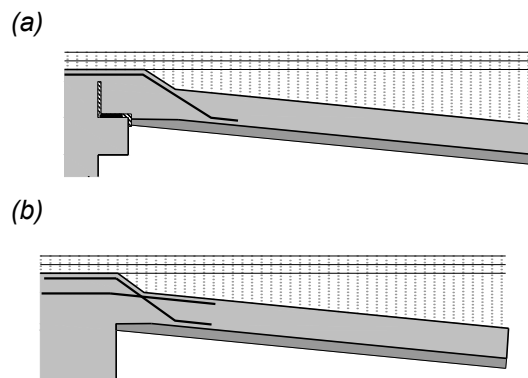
(a) Detail proposed by [OFROU 2011] and (b) improved connection detail between abutment and transition slab (for standard and integral abutments [DREIER 2011])
